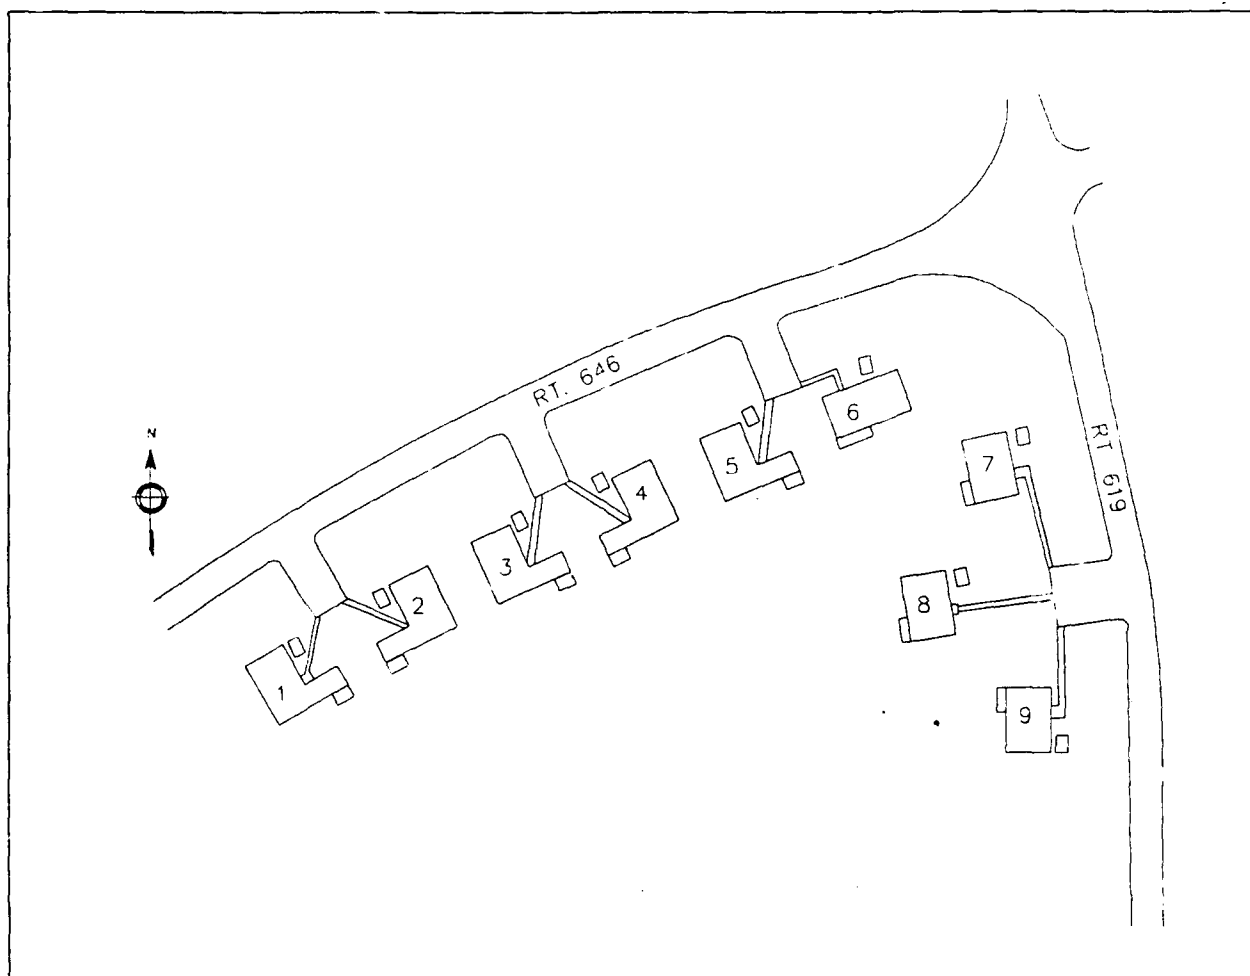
Site Plan Map of Manassas Army Housing Units
